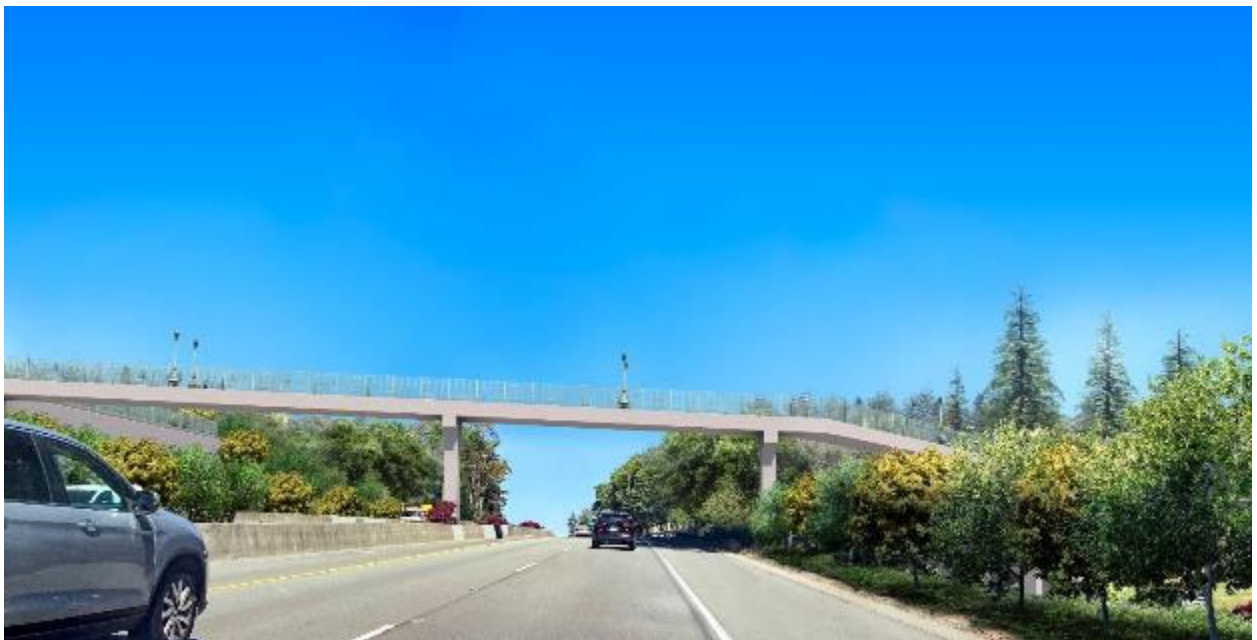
Alternative 3a/b. Proposed view of pedestrian overcrossing from SR-13, northbound. View north.
